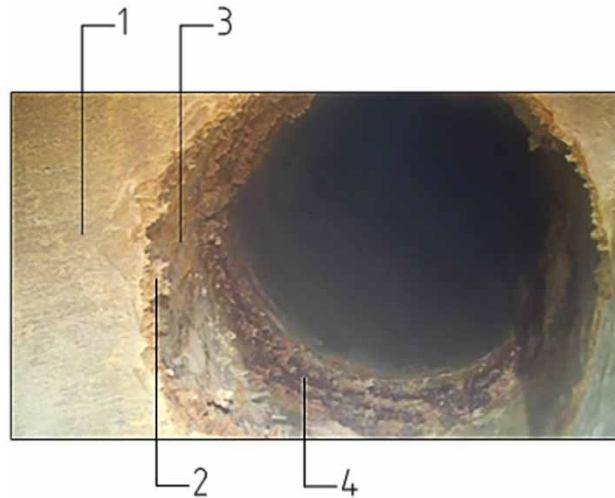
| Pipe scale at the branch pipe of tee for water supply pipeline. (1) The inner wall of the tee main pipe; (2) pipe scale at weld position of tee branch pipe and main pipe; (3) pipe scale at tee branch pipe; (4) pipe scale at weld position of tee branch pipe and flange.
